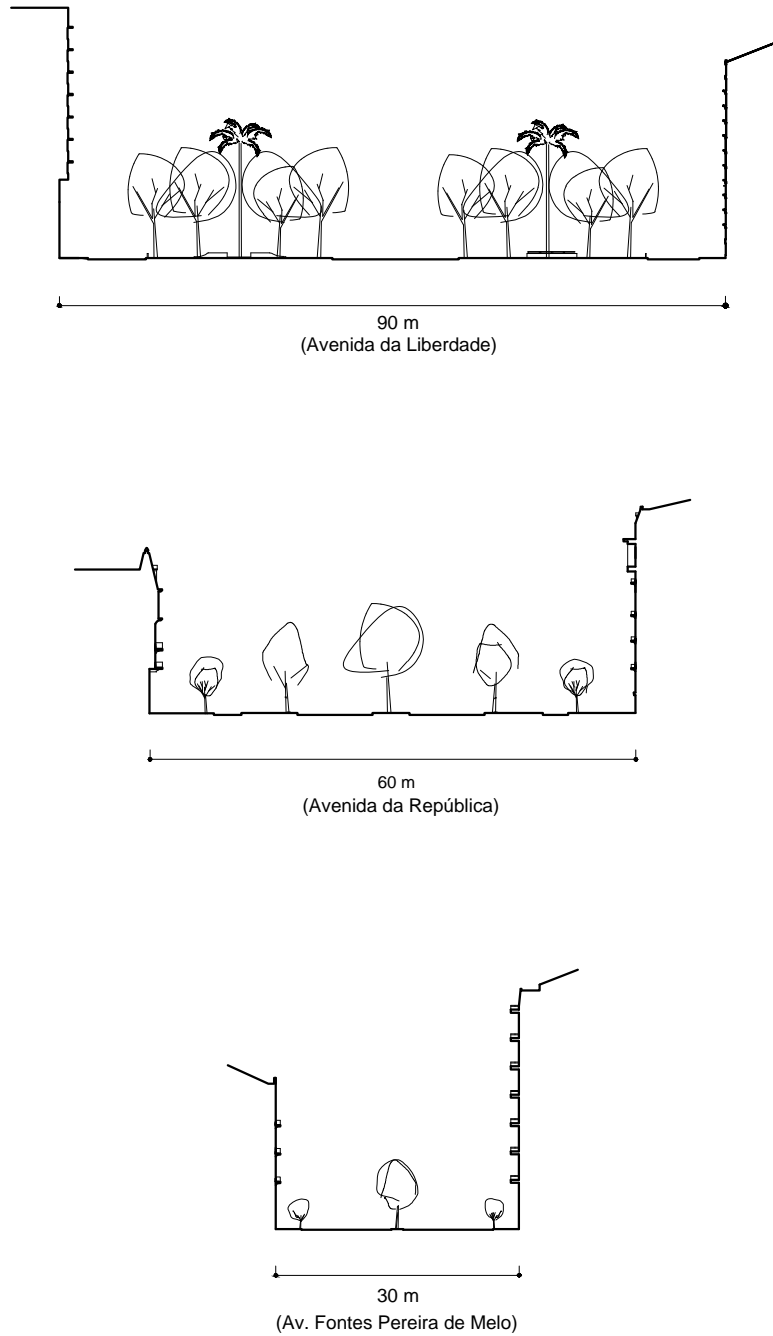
Cross-sections of the major avenues in the Avenidas plan. (Source: Author's Edition).
